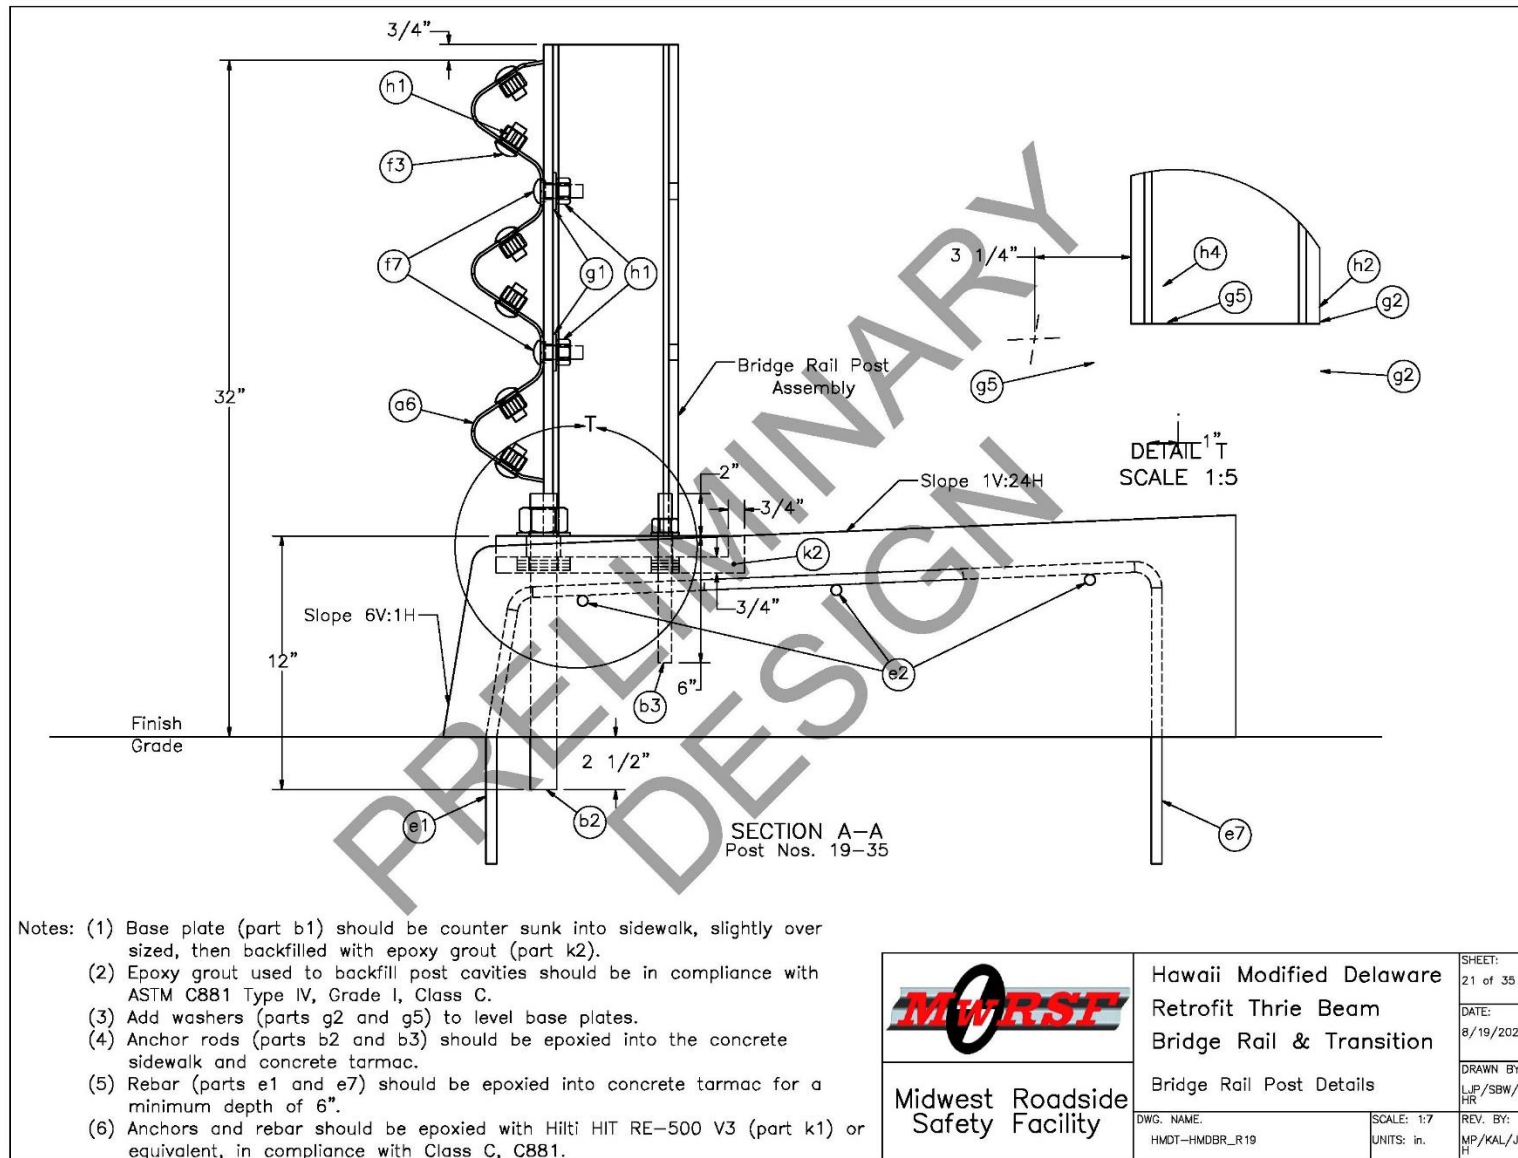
Bridge Rail Post Details, Test No. HMDT-1
